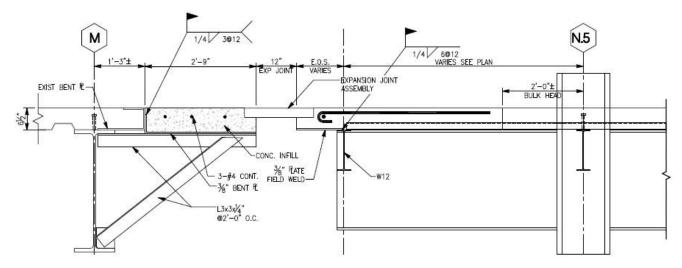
Expansion Joint Section Drawing Courtesy of JCJ Architecture
